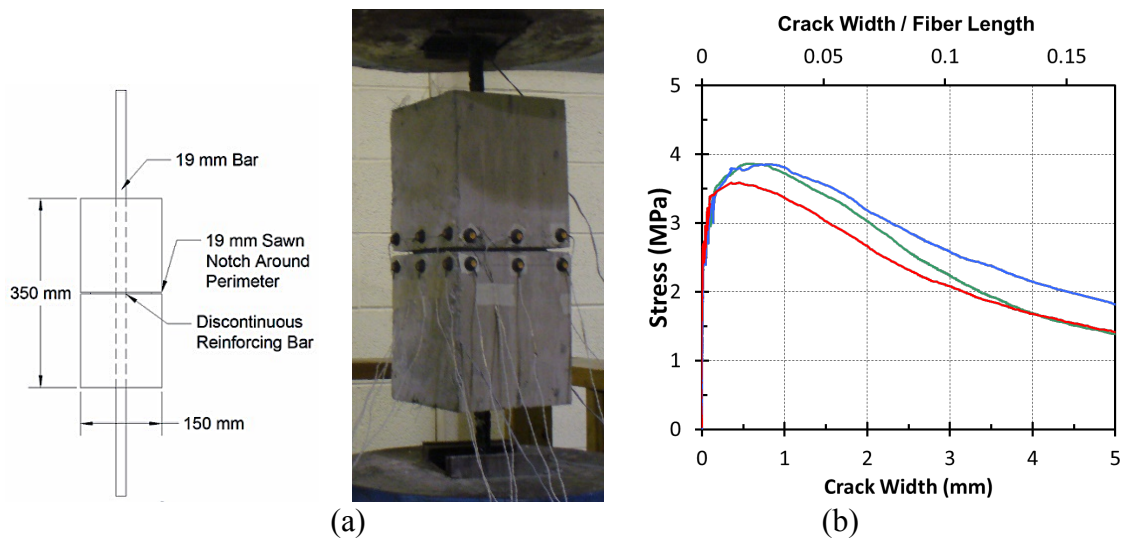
Proposed tensile test: (a) specimen details; (b) sample result.
